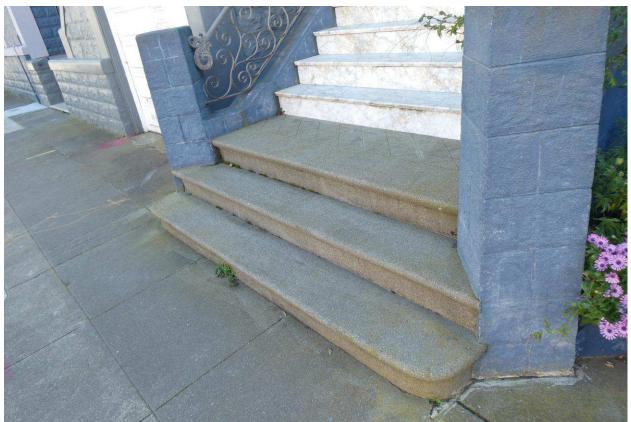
Detail showing plants and biological growth at joints in the concrete and marble stairs as well as beneath some of the bullnose marble stair treads.
